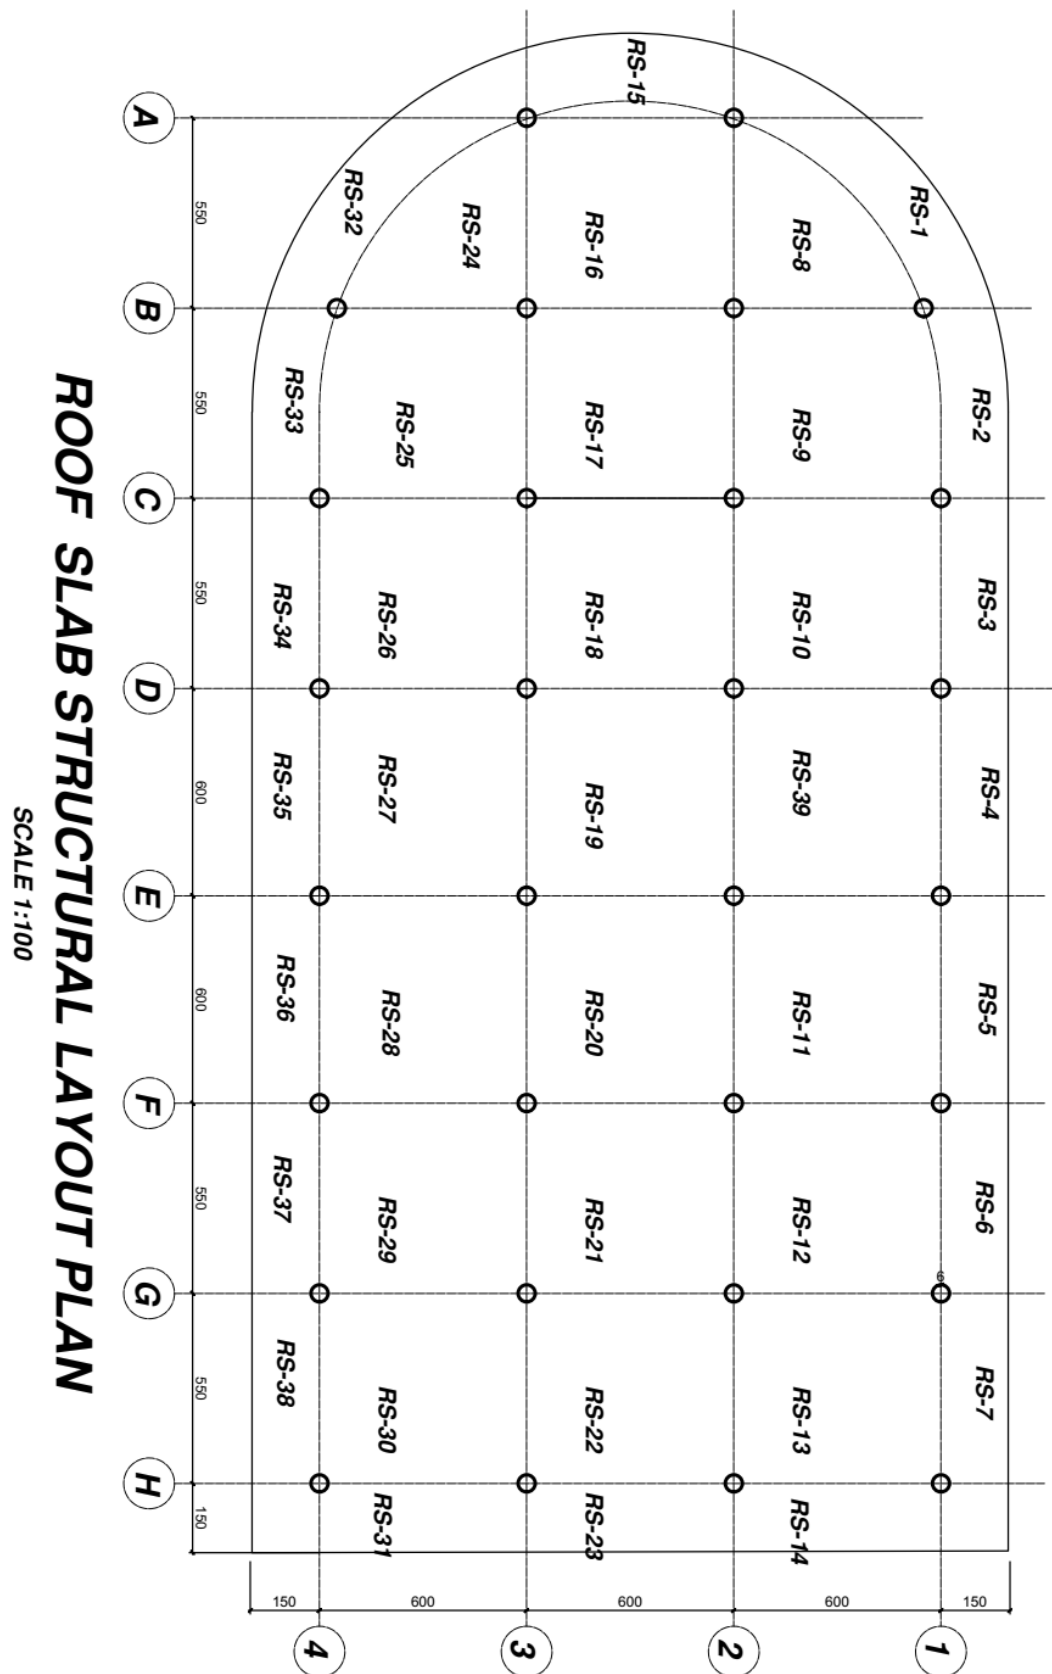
Roof slab structural layout plan for G+2, G+7 & G+12
